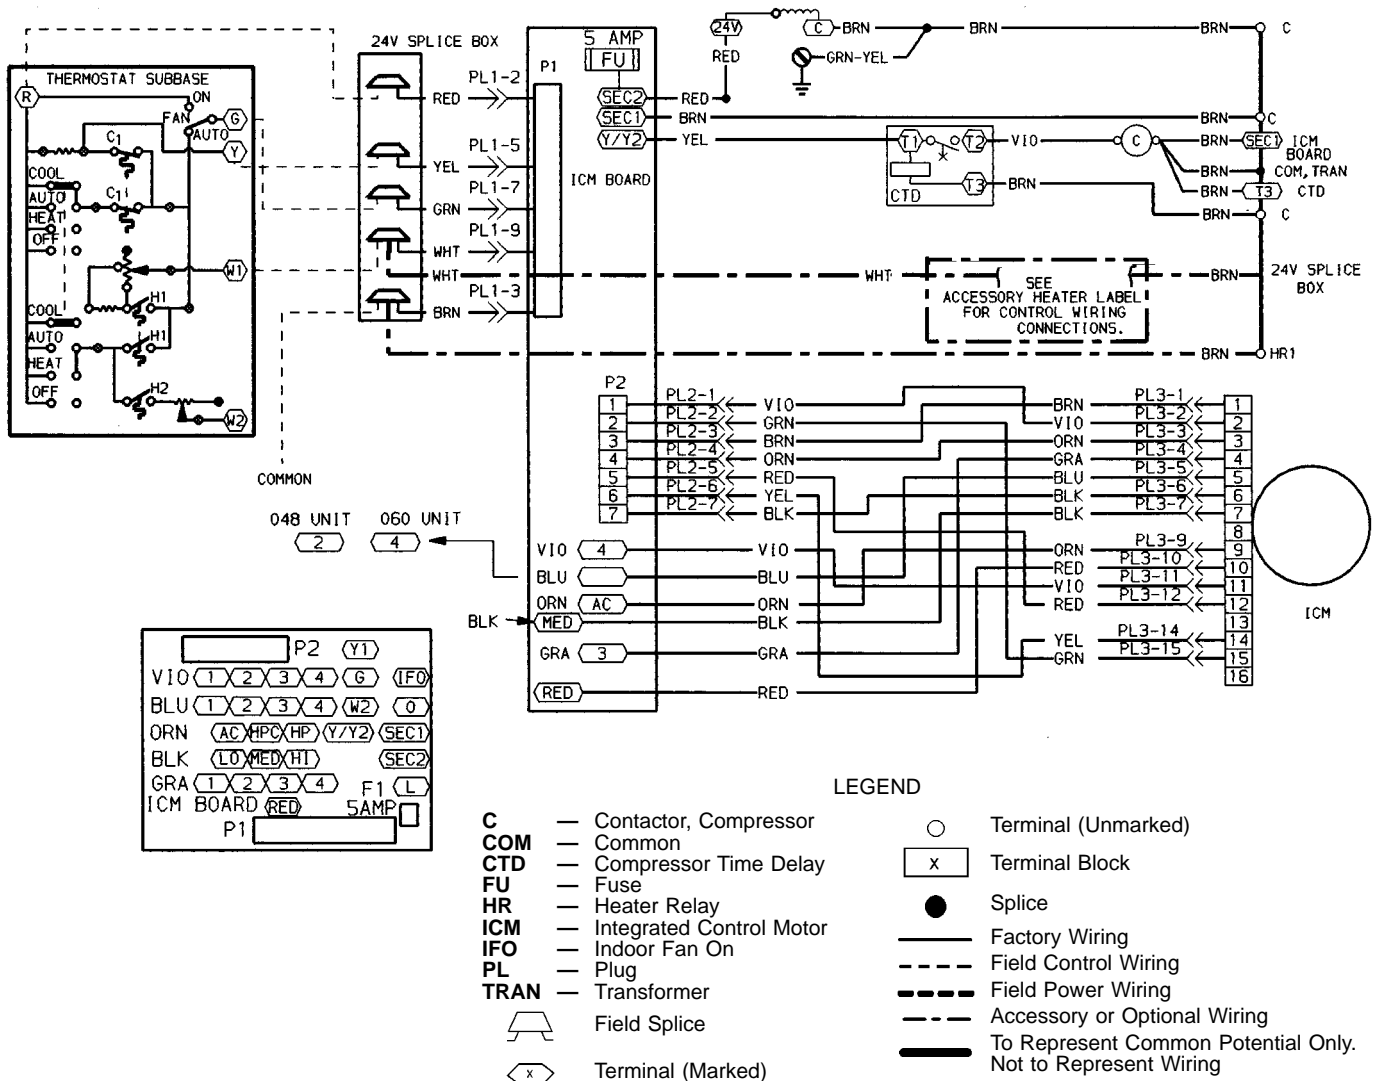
Units 50SX048,060 — 208/230-1-60, Integrated Control Motor Wiring Schematic
